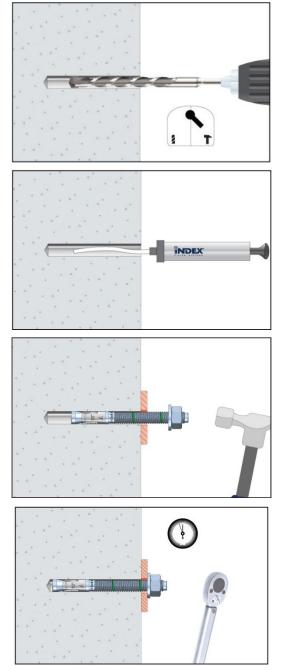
ANCHOR INSTALLATION PARAMETERS
